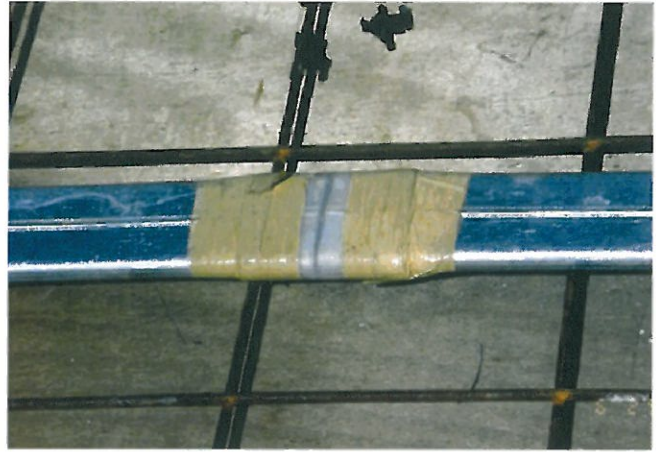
C-5 Taped Duct Splice (P184)
